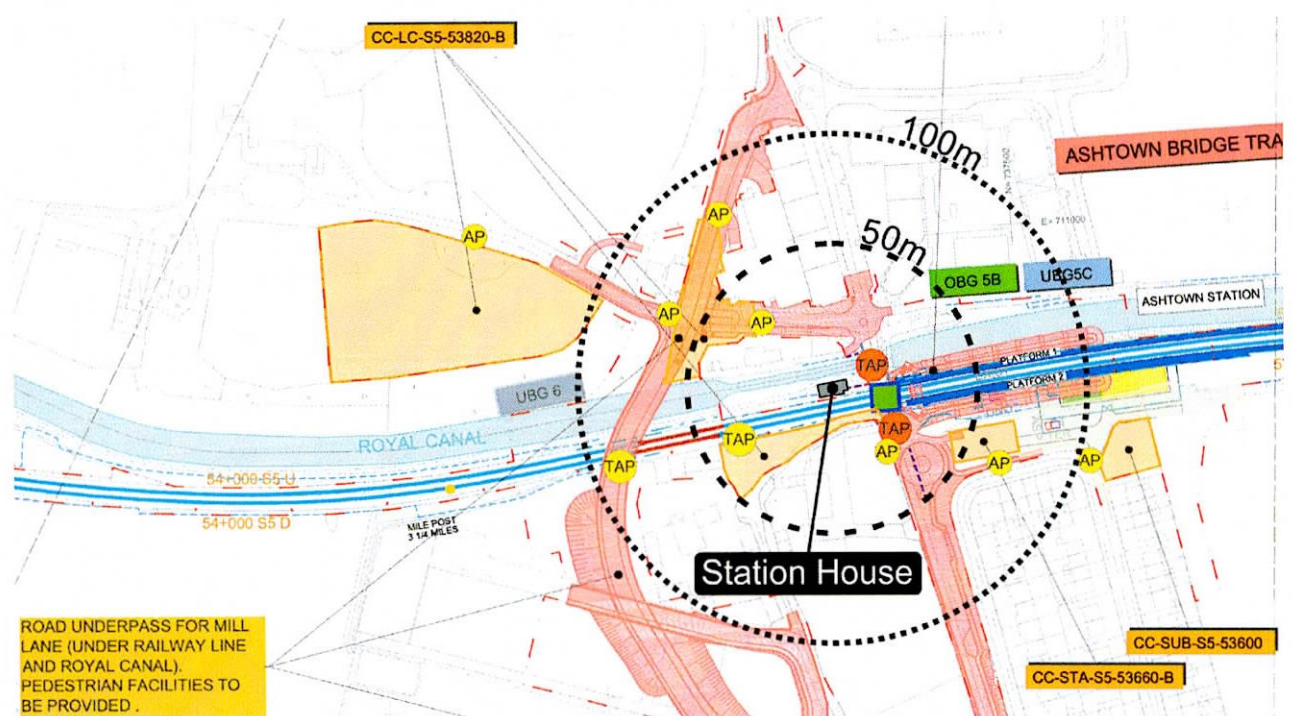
Excerpt 'General Design Project Schematic Layout' Sheet 09 of 42 (annotation added)
